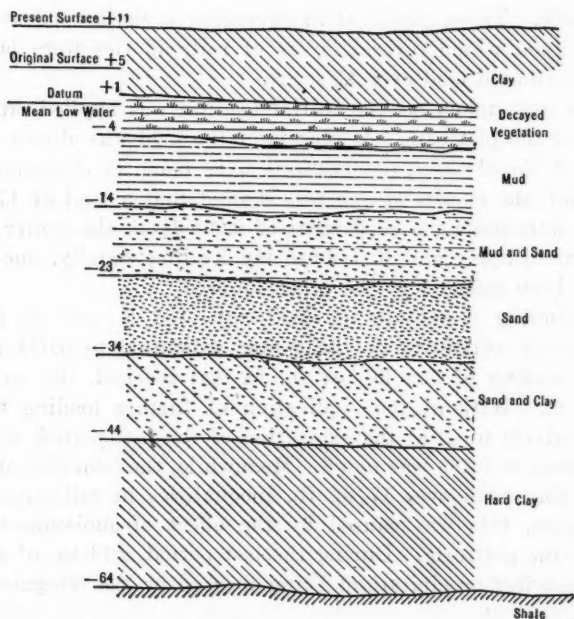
TYPICAL PROFILE OF MATERIAL OVERLYING ROCK AT PORT NEWARK, N. J.
